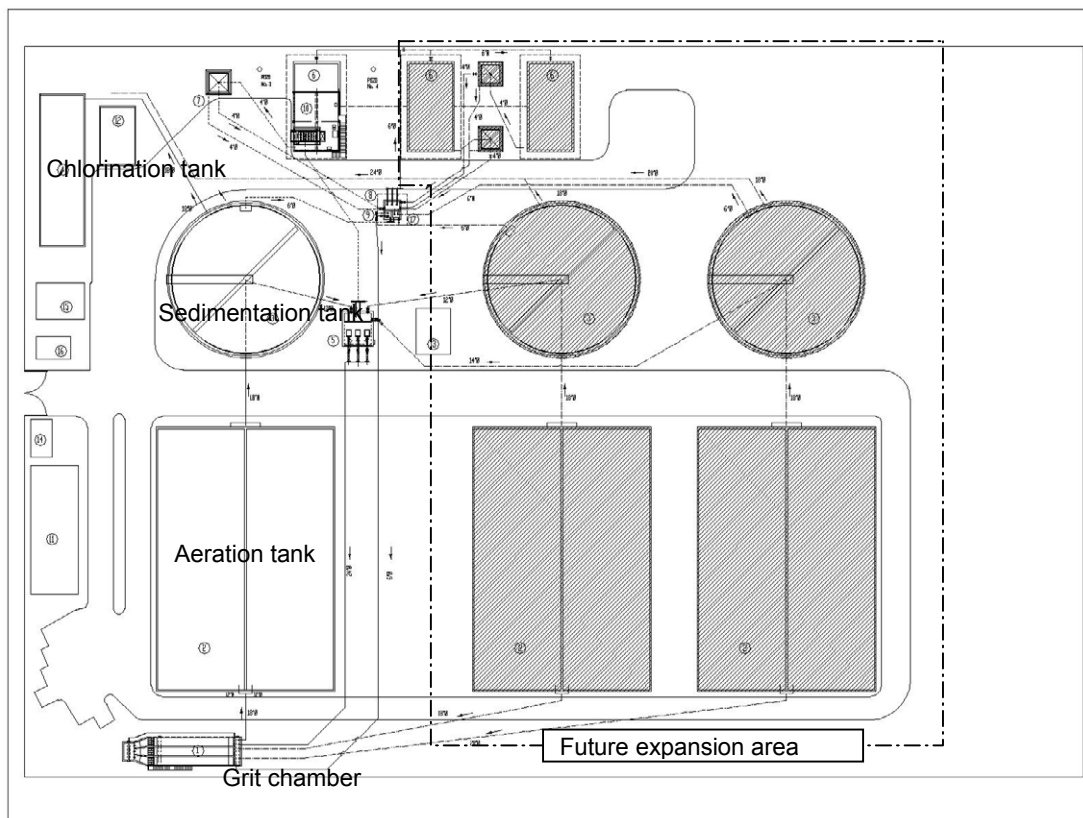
Layout of Chetumal Sewerage Treatment Plant
